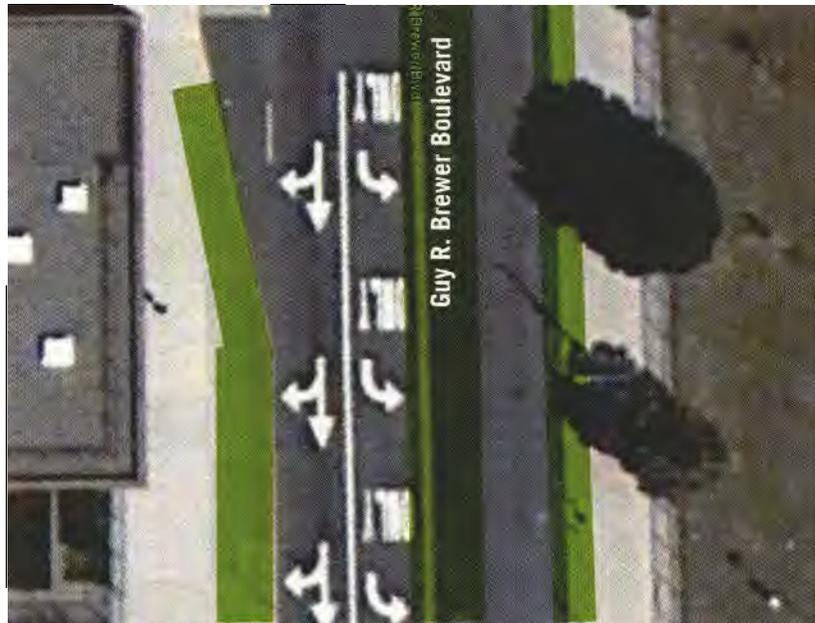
Planted Boulevard Overlay Guy R. Brewer Boulevard
